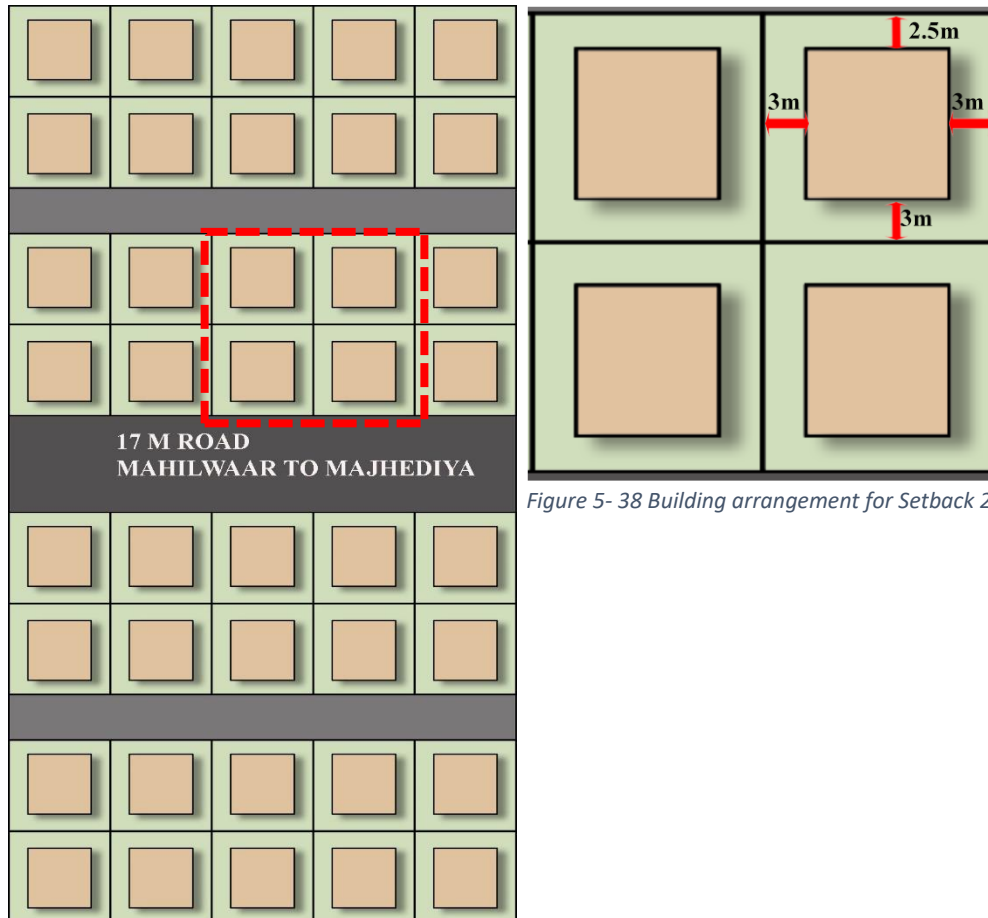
38 Building arrangement for Setback 2.5m & 3m
